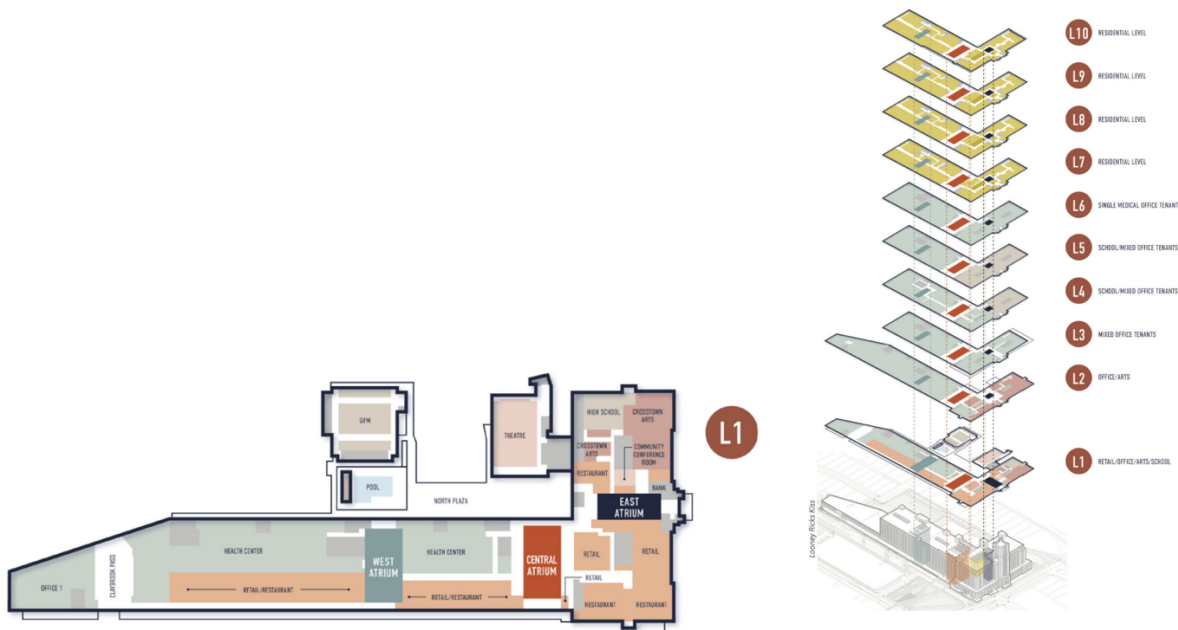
Crosstown Concourse Site Plan, Source: *Mitigating Industrial Land Use Impact Through Building and Site Design
